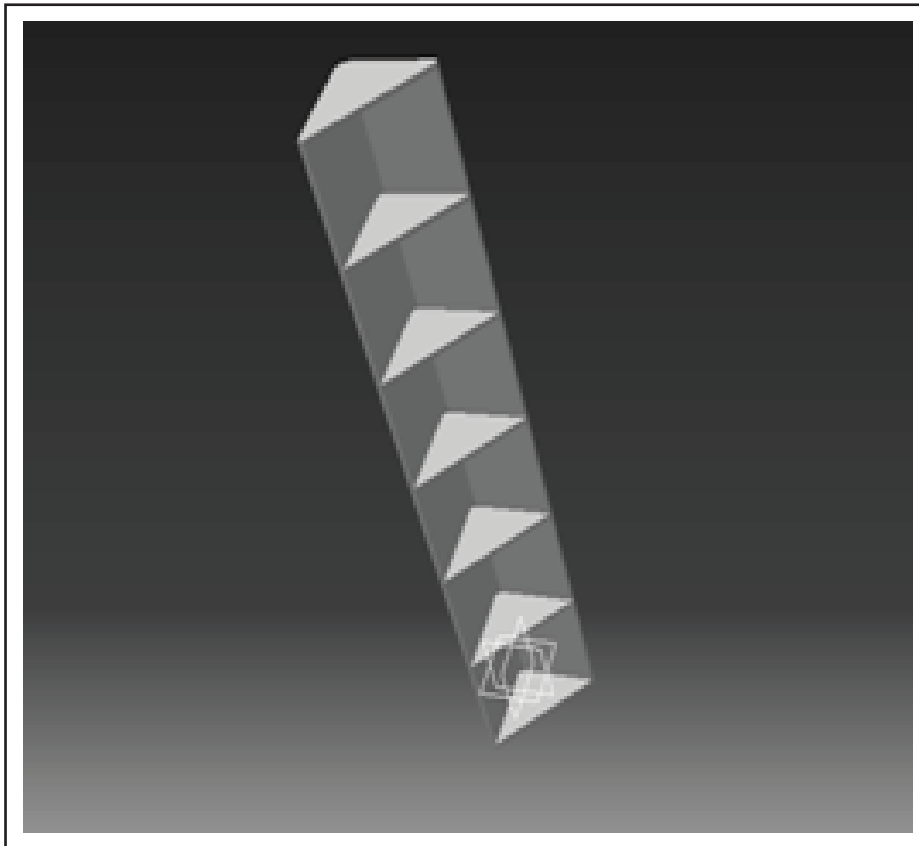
Column Model With Stiffener at Line Joining the Outer Legs of an Angle
